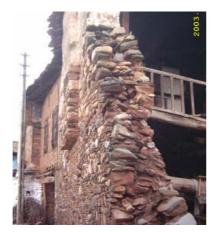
, Section of a stone masonry wall and the use of atkı in Karşıyaka (Taşdöğen)
